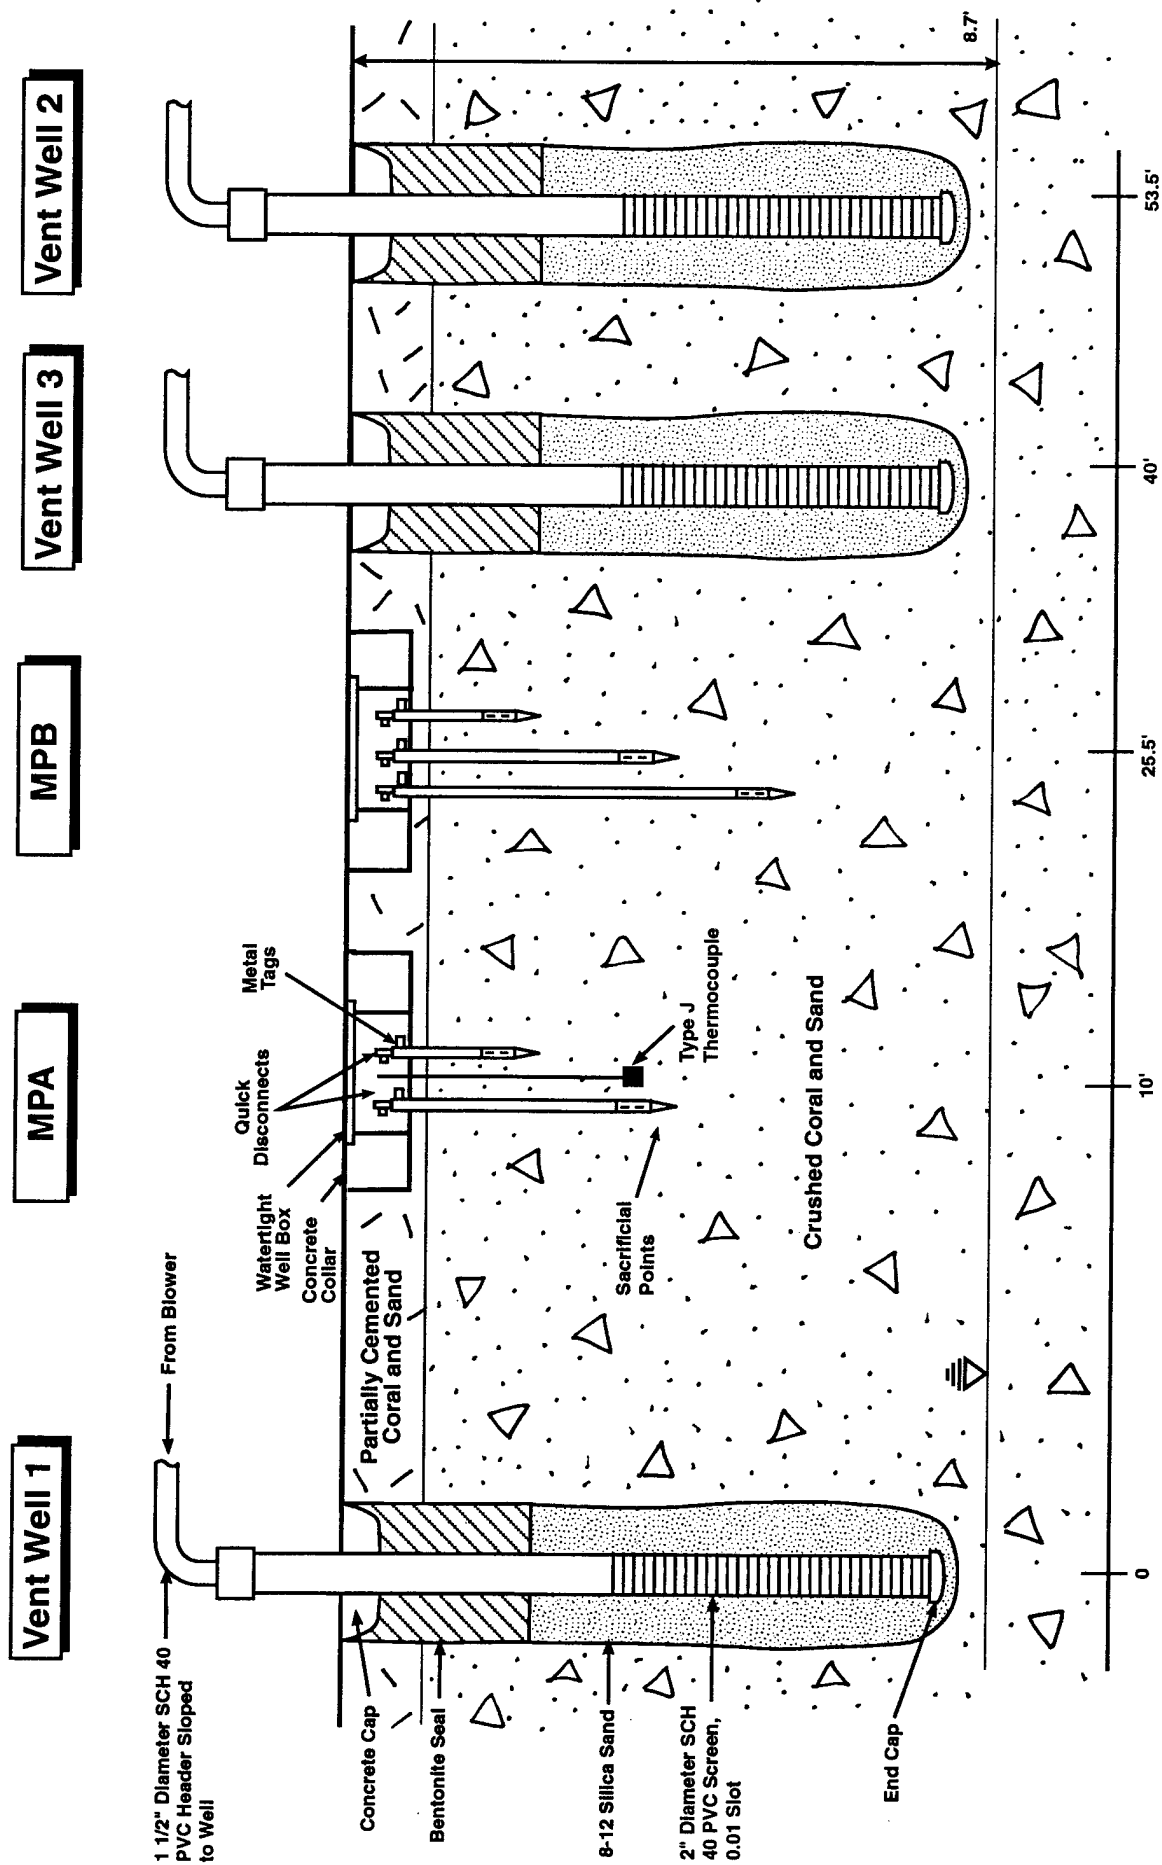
Cross Section of Vent Wells and Monitoring Points at the Old Fire Training Area Showing Site Lithology and Construction Detail (not to scale)
